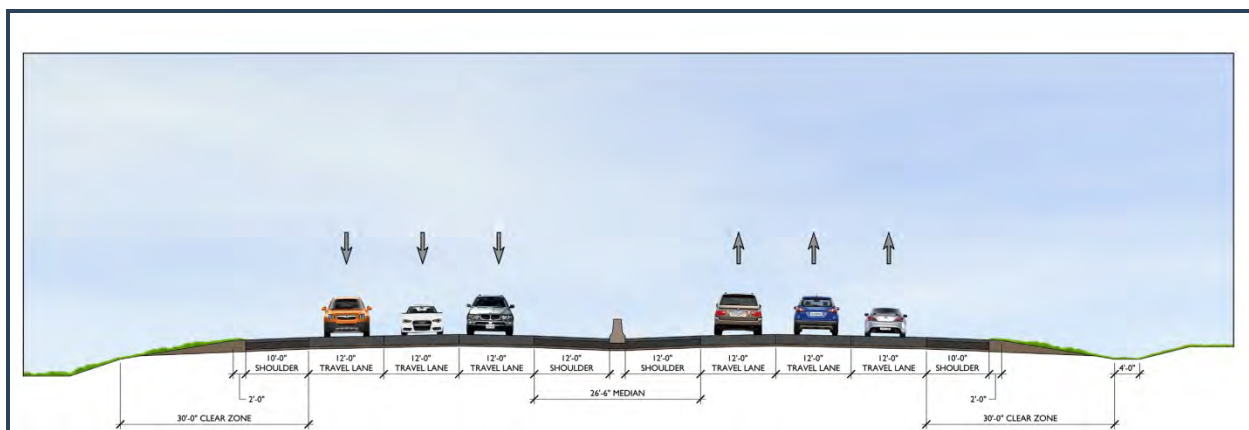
West Alternative 2 – Rural – Six Lanes
